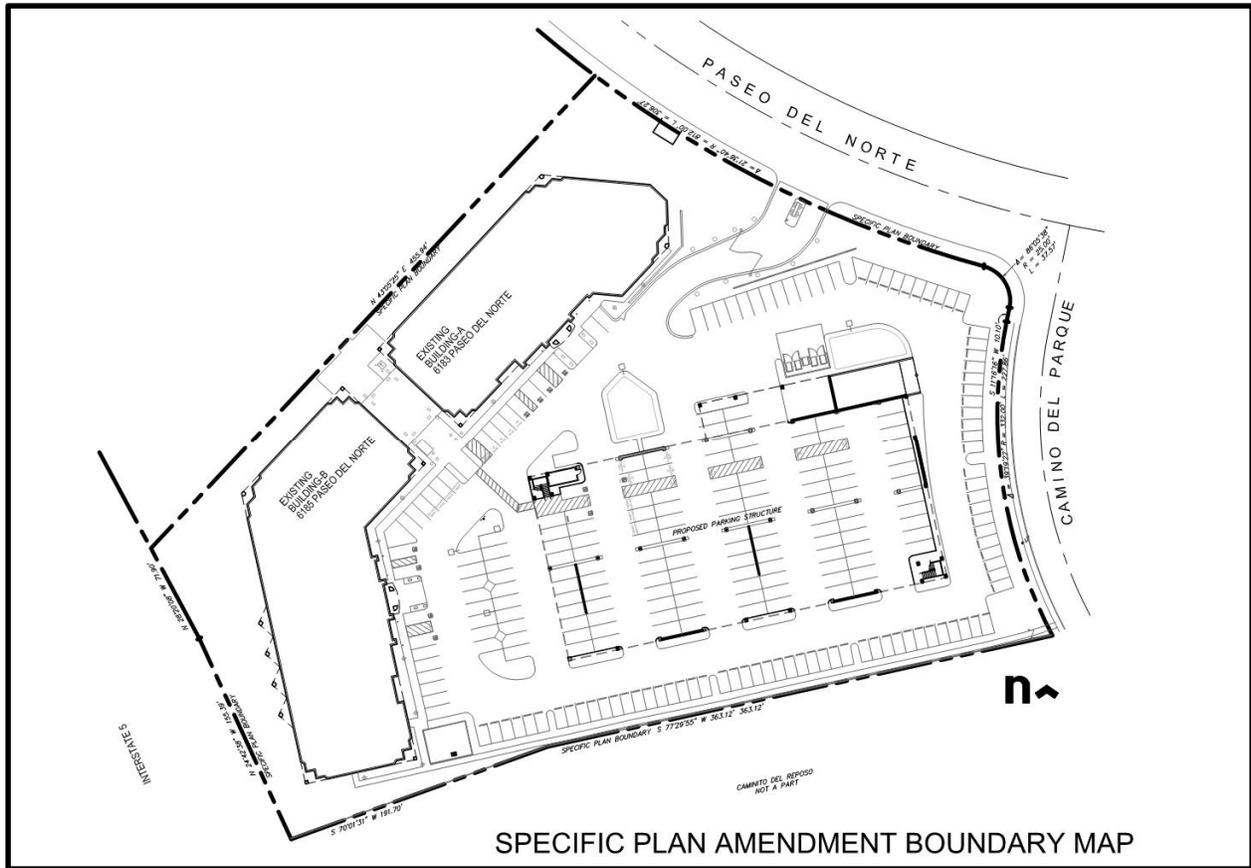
LAND USE PLAN – CARLSBAD CORPORATE PLAZA SPECIFIC PLAN
